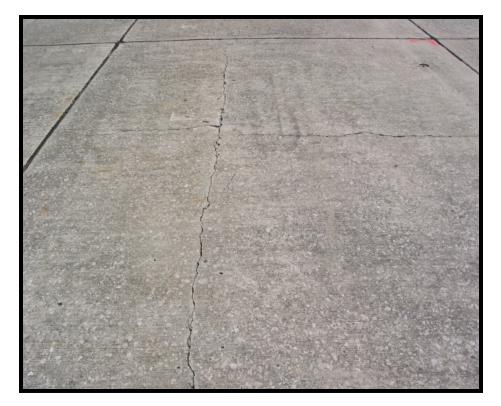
Low-Severity Shattered Slab/Intersecting Cracks
